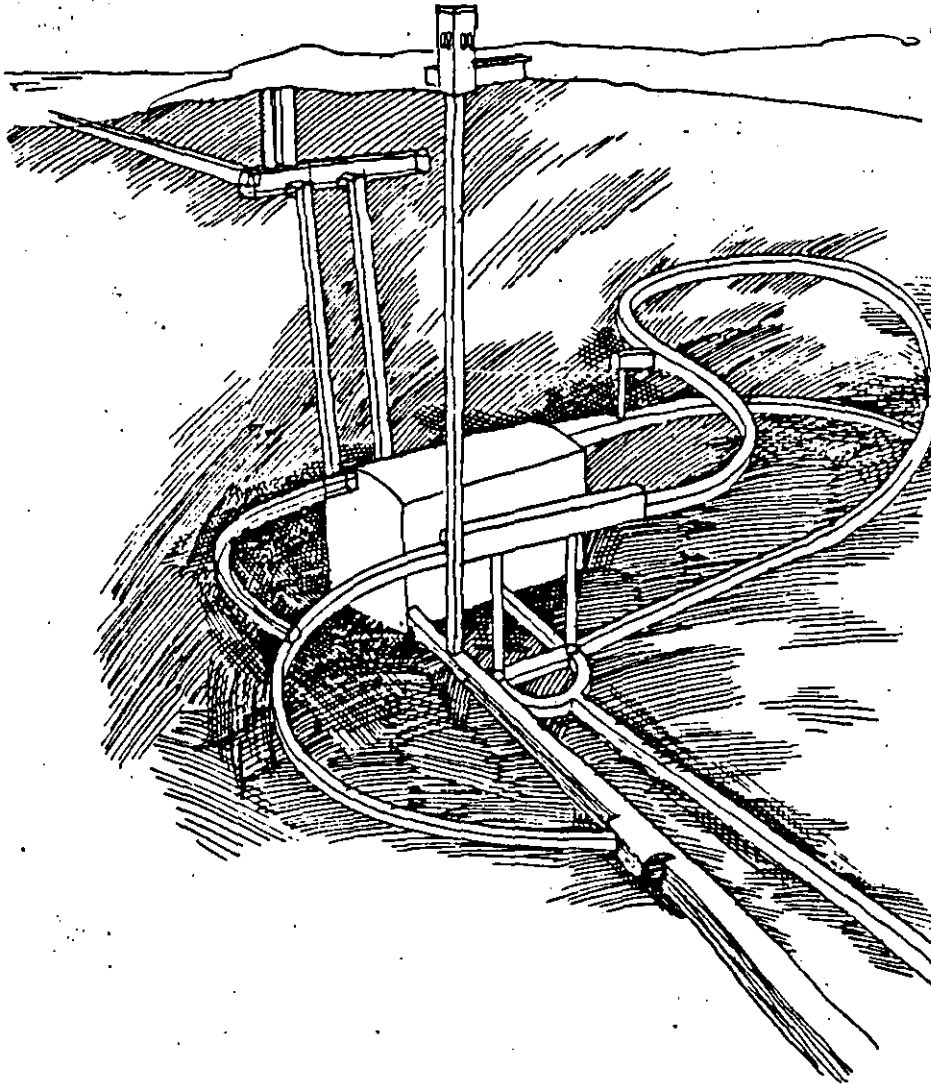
Typical tunnel system in a hydroelectric power plant.
